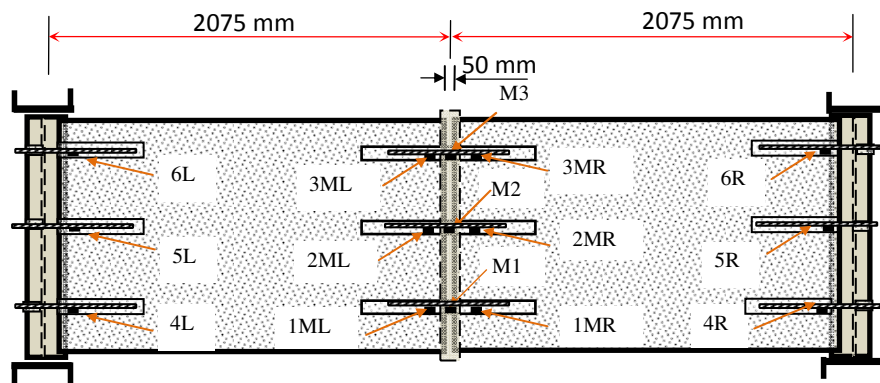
Illustrative diagram of the full scale floor joint tests with the layout of strain gauges
